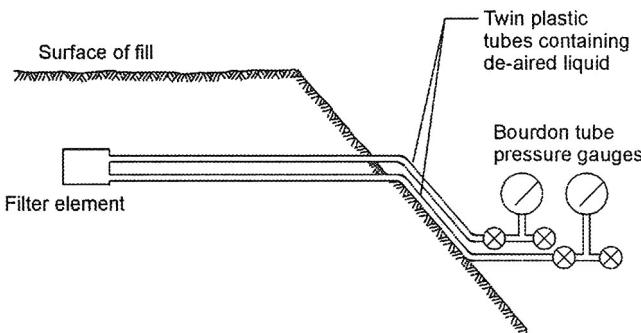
A. Twin-tube hydraulic piezometer schematic
